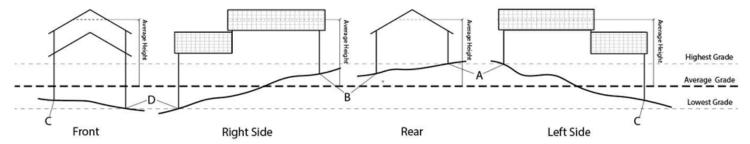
SLOPED-LOT BUILDING ELEVATIONS SHOWING AVERAGE GRADE AND HEIGHT (FOR GABLED ROOF)
